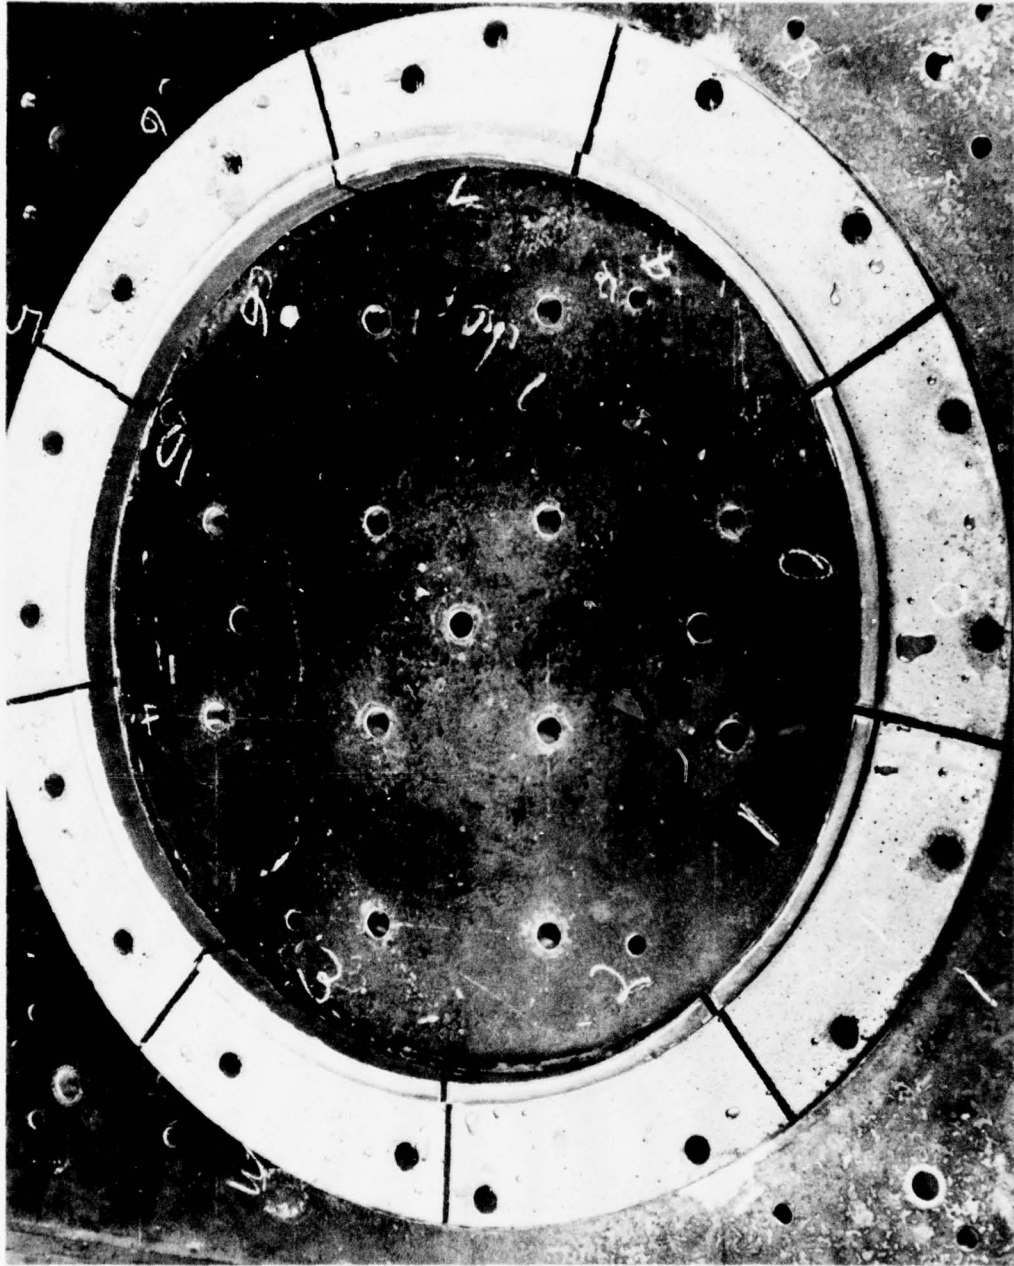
Top surface of the chock pads of Test Structure No. 2 after separation
